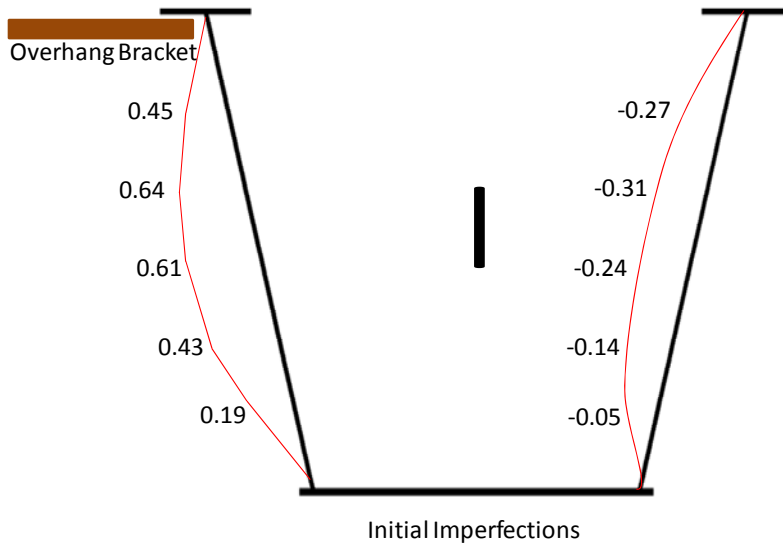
Ext. Girder Web Deformations due to Deck Casting
